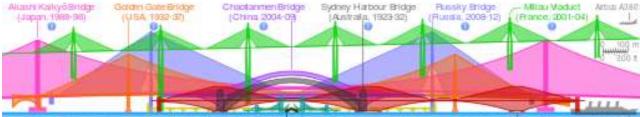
Akashi Kaikyō Bridge – Kobe, Japan
